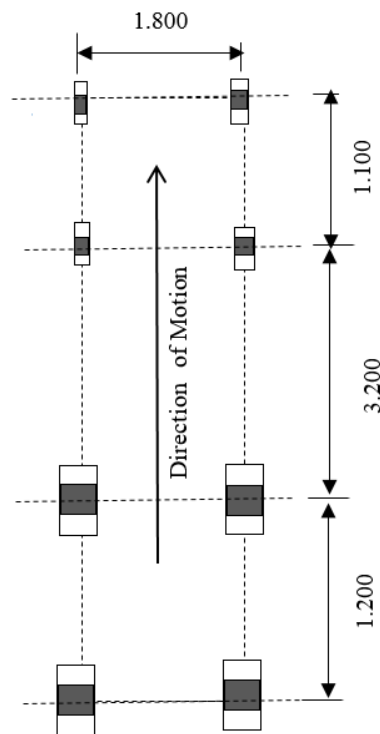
Plan view of IRC Class A Loading (all dimensions are in m).
